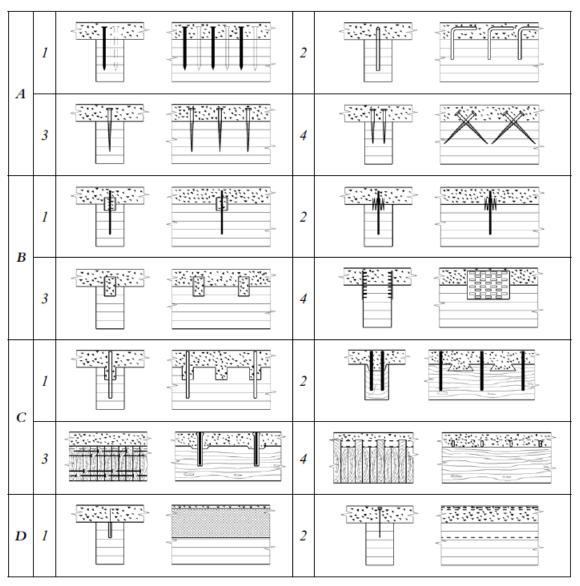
Examples of timber-concrete connections. (A1) Nails, (A2) Dowels, (A3) Screws, (A4) Inclined screws, (B1) Split ring, (B2) Toothed-plate, (B3) Steel tubes, (B4) Punched metal plate, (C1) Pre-bored notches with fasteners, (C2) Trapezoidal notch with fastener, (C3) cup indentations and prestressed steel bars, (C4) Nailed timber plank deck with steel shear plates slotted through the deeper planks, (D1) Glued-in steel lattice girder, (D2) Glued-in steel plate. [70]
